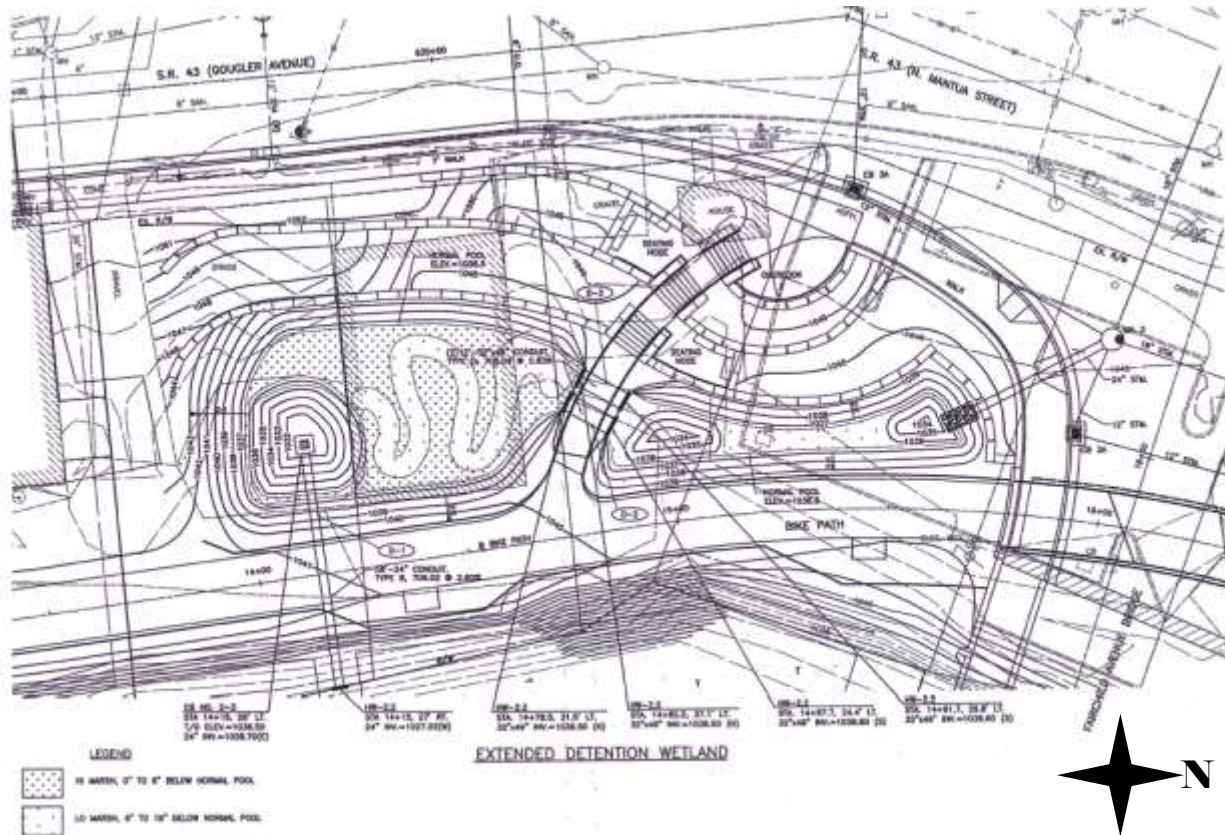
Plan view of constructed wetland for Crain Avenue Project
